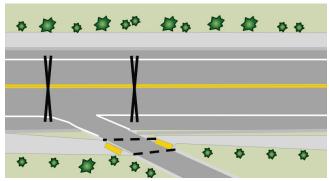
Unmarked Crosswalk Connecting Curb Ramps across Diverging Ramps
